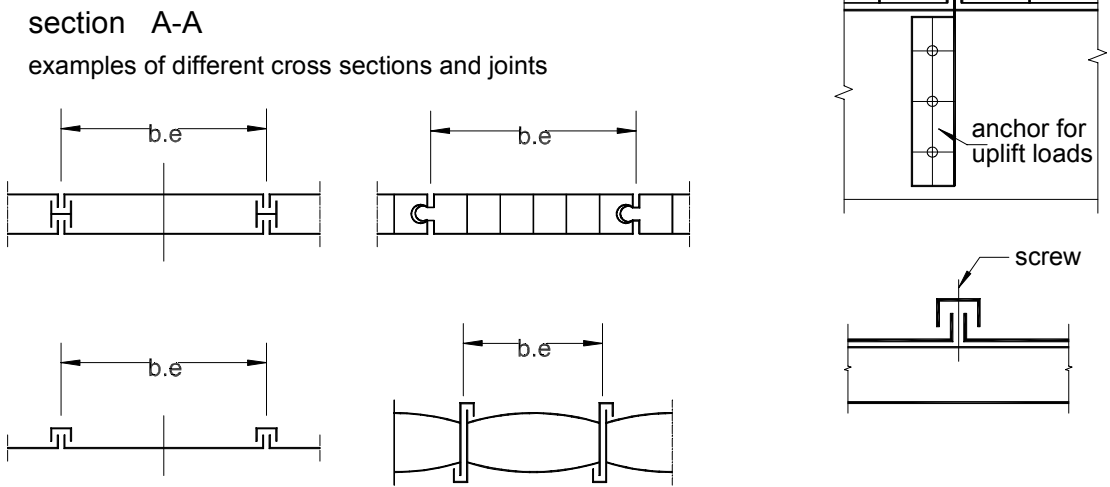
Examples of flat roof kits without additional bearing profiles single span systems
